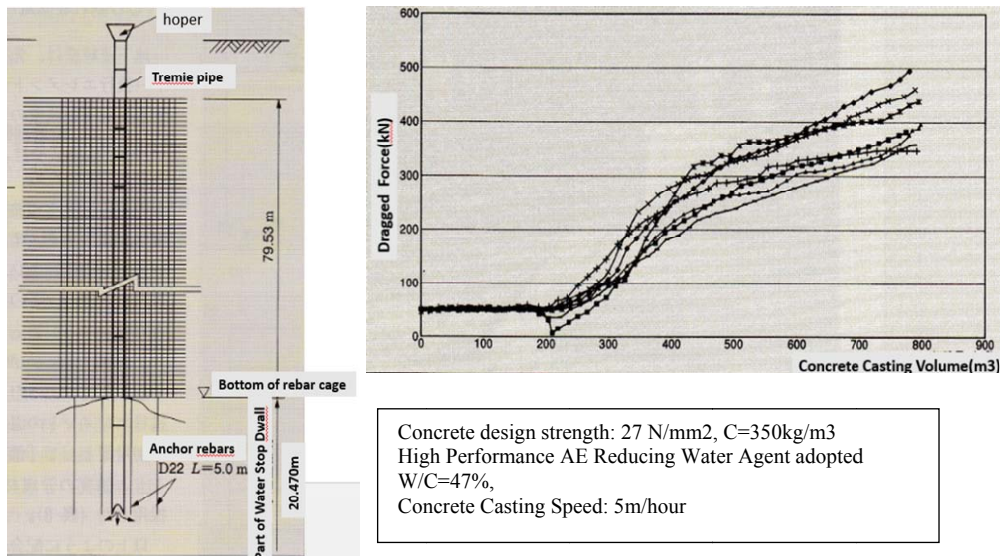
Re-bars Cage and Dragged Force during Casting Concrete ²⁴⁾
